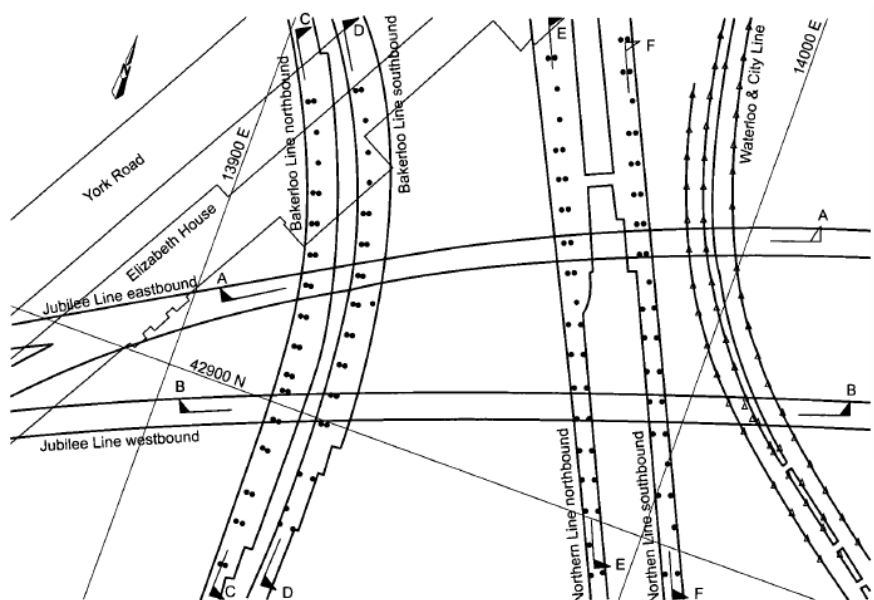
(a) the plan of existing tunnels: Bakerloo, Northern and Waterloo & City Line tunnels, west of Waterloo station in relation to the new JLE running tunnels with the locations of monitoring points.
